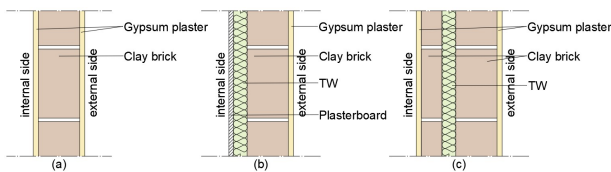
Configurations of wall structures simulated to compare the sound insulation ability of a reference wall (a) with that of single-leaf (b) and double-leaf (c) walls involving the addition of TW-68 and TW-96 layers.
